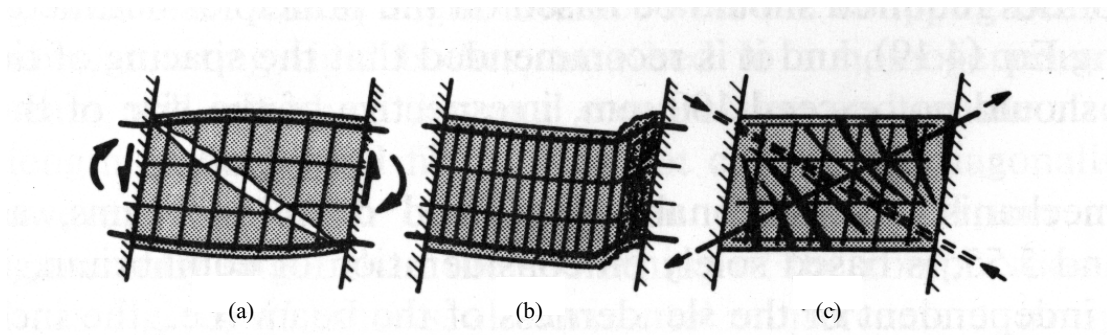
Shear in concrete coupling beams (from Paulay and Priestley 1992):
